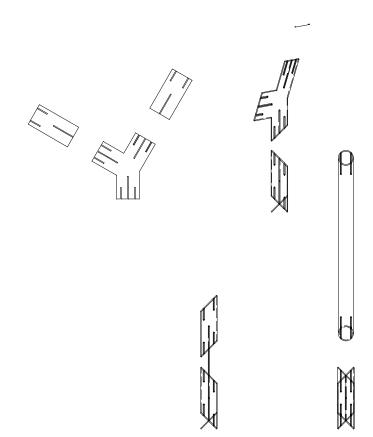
Joining of cardboard tubes to create branches (Author, 2010)
